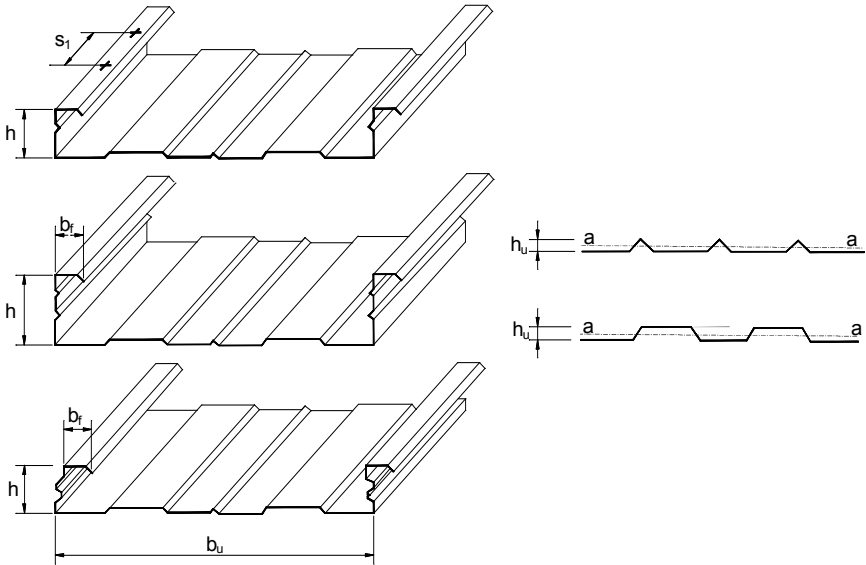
Typical geometry for cassette sections (CEN, 2006a)
